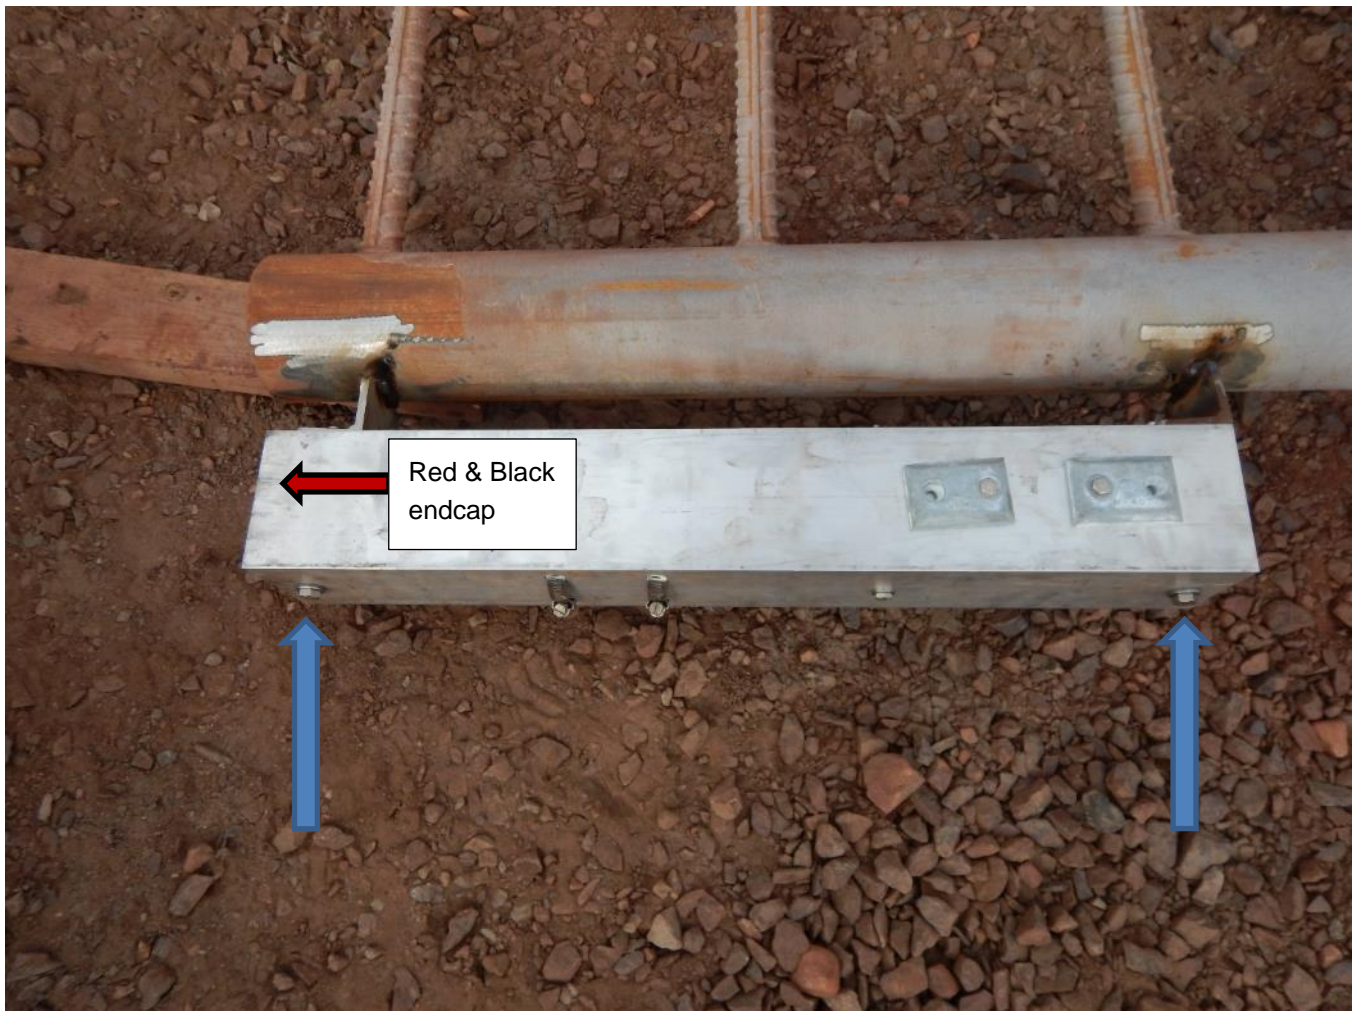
Aluminum square tube mounted to the bottom of the steel ladder located at the ore dock. Arrows show location of mounting bolts which attach the square tube to the welding tabs on the steel ladder.
